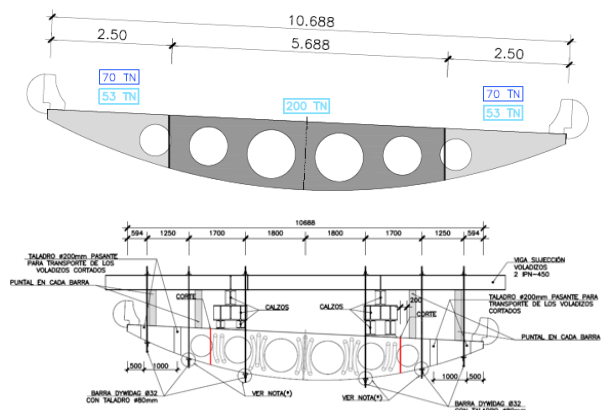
Deck cross section divided into three parts at spans 16 and 17 over railway lines.
